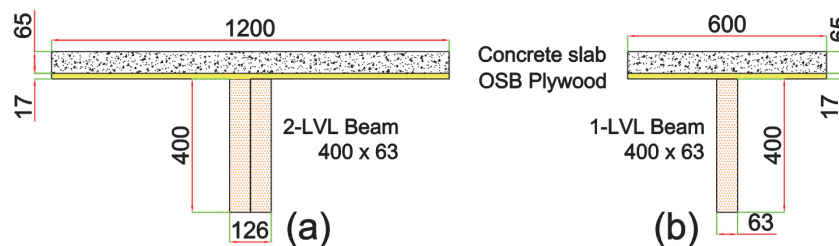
The cross-section of the tested TCC beams: (a) F1 and G1, (b) the reduced section of the rest (dimensions in mm) [14].
